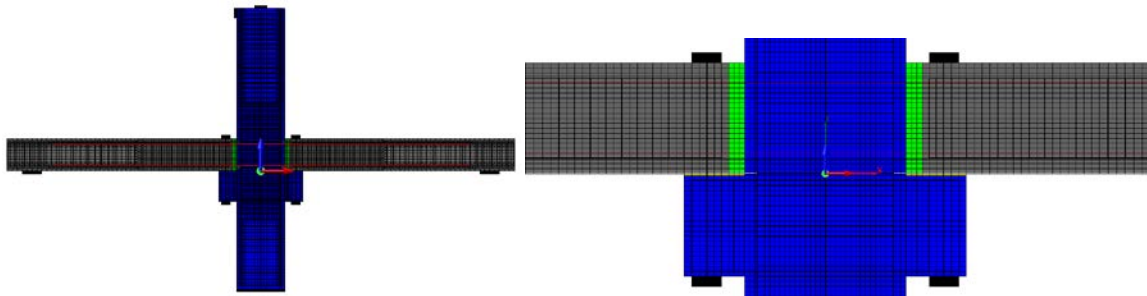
a) - Model A with connection mortar stratum; b) zoom of beam-column joint region.
